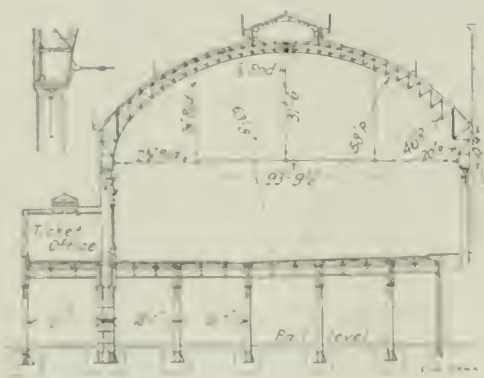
CROSS SECTION OF MAIN ENTRANCE HALL WITH THREE HINGED ARCHED-ROOF TRUSSES.
